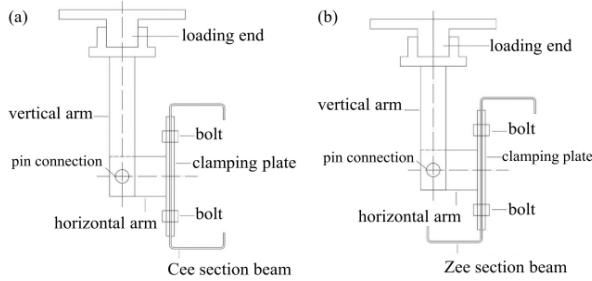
The test setup to apply the torsional loading (a) Cee section, (b) ZEE section
